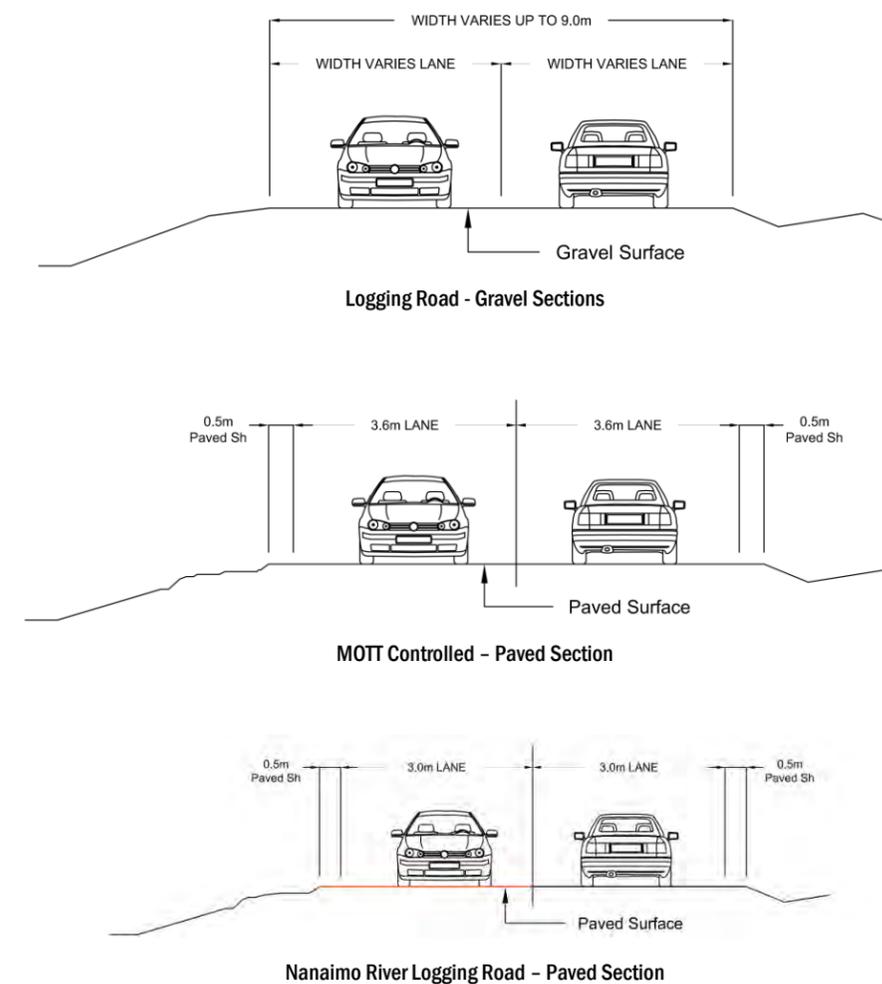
ROUTE 2D - TYPICAL CROSS SECTIONS
